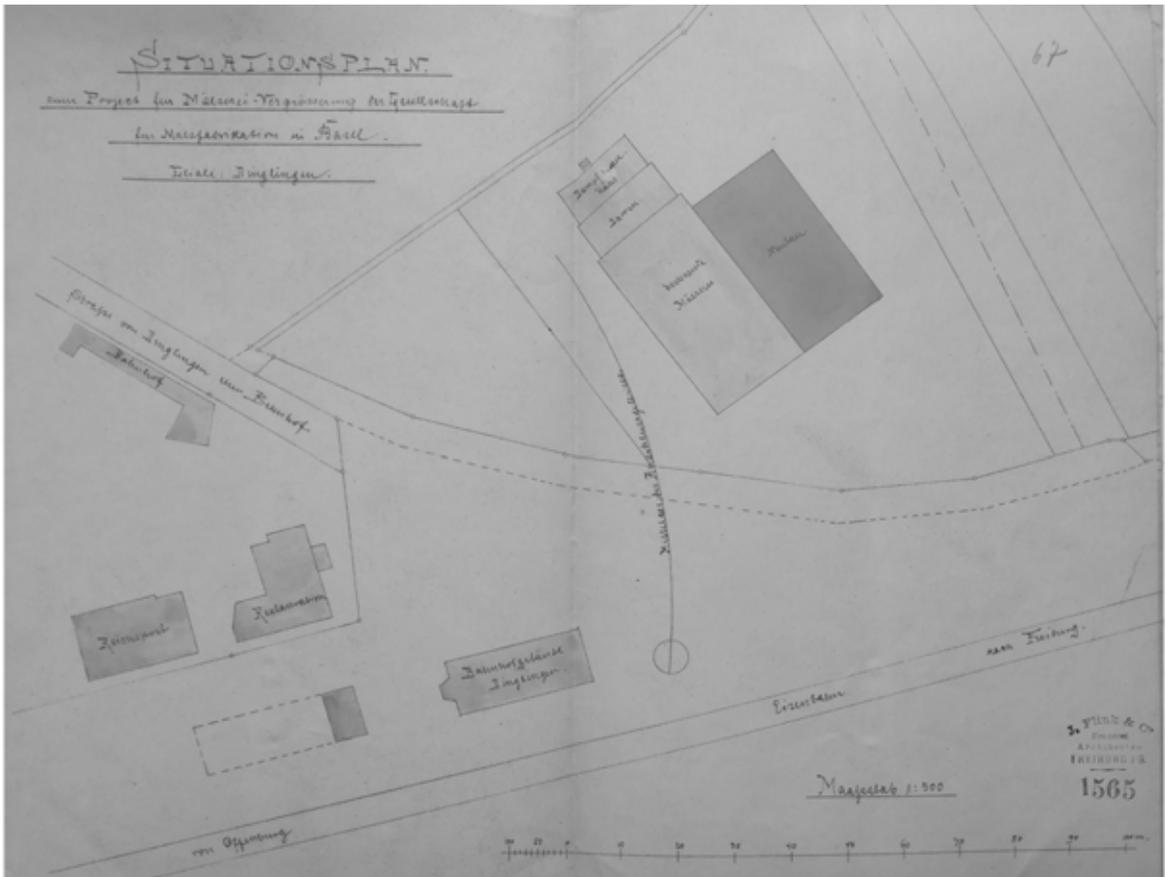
Map of the company property (the reinforced concrete extension is marked) as part of the building application of 1895. Photo: Kuban. Lahr Building Authority Archive.
